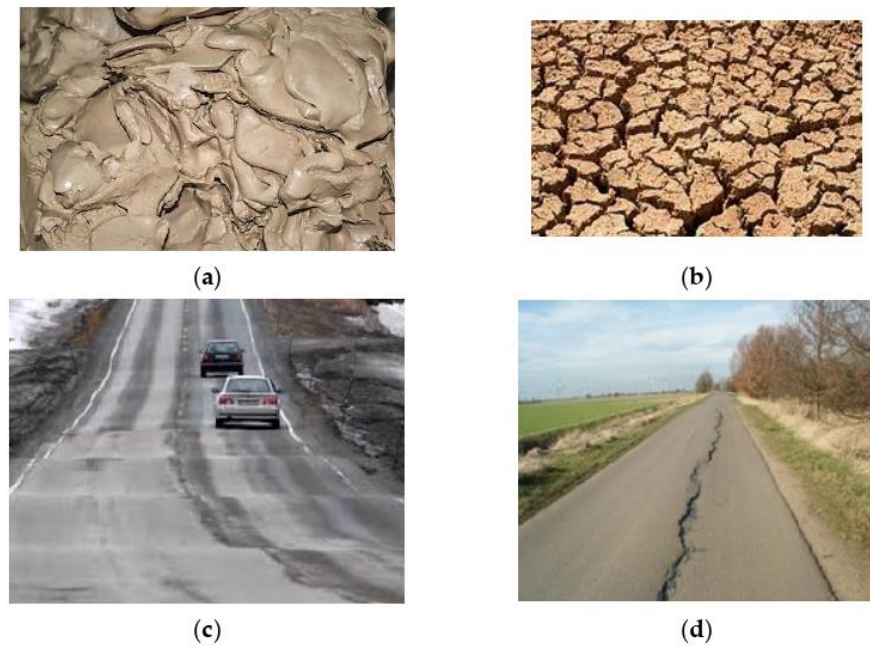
(a) Typical wet expansive soil [3]; (b) typical dry expansive soil [3]; (c) uplifting of flexible pavement [3]; (d) typical longitudinal crack on road pavement due to expansive subgrade [3].
